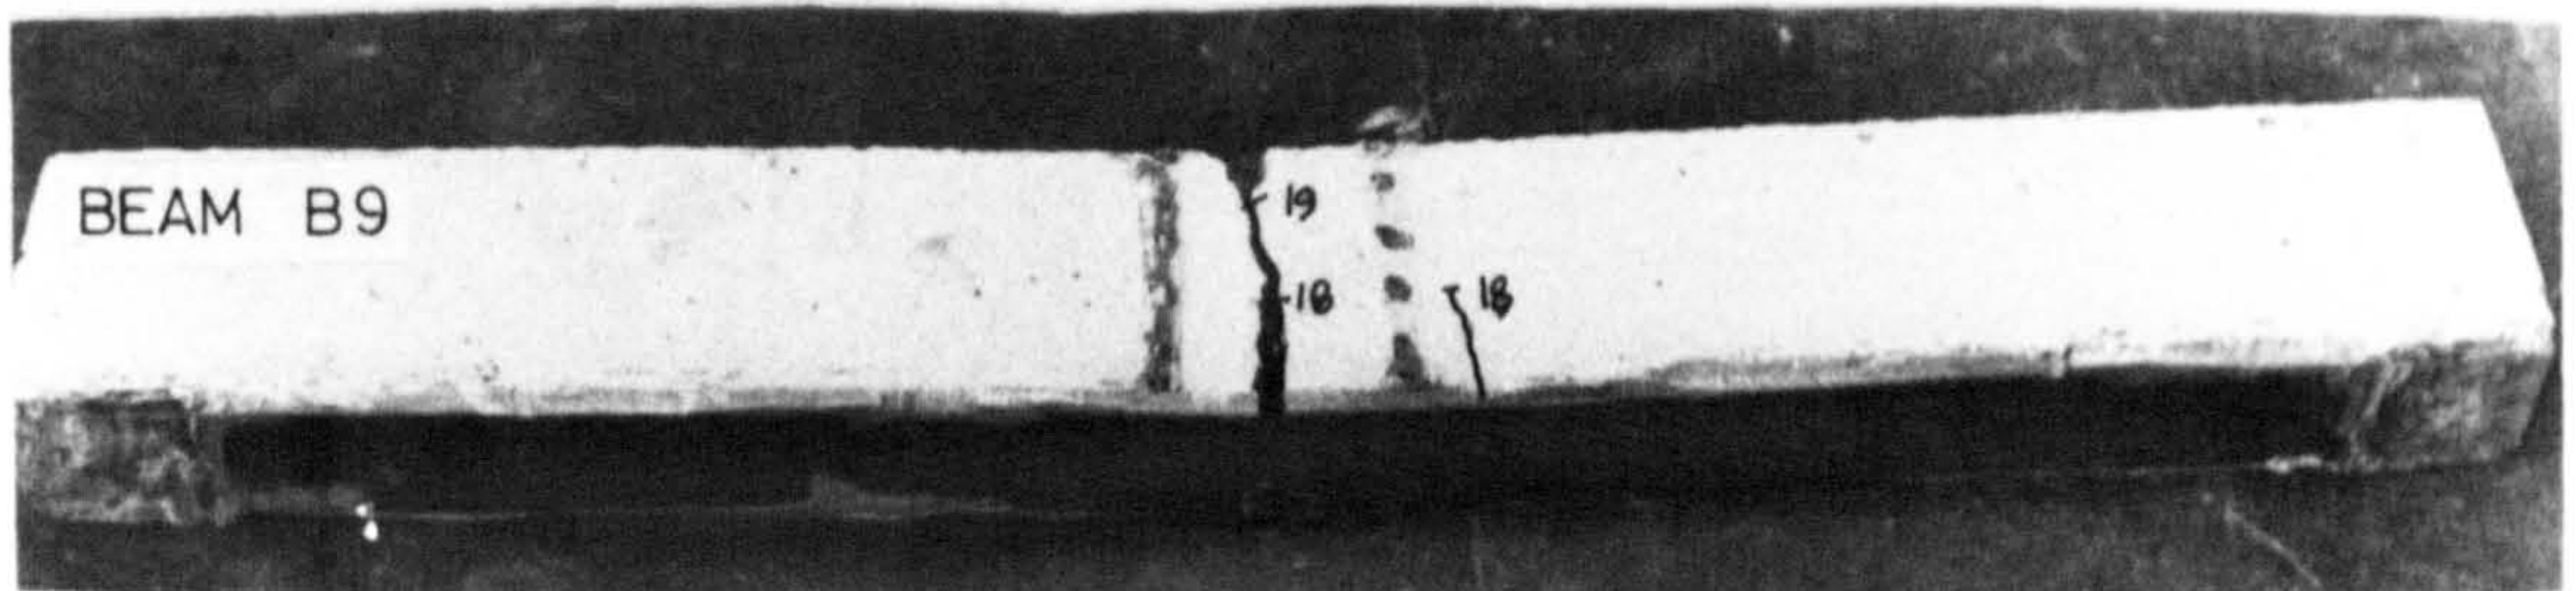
TYPICAL BEAMS AFTER FAILURE : SERIES A
